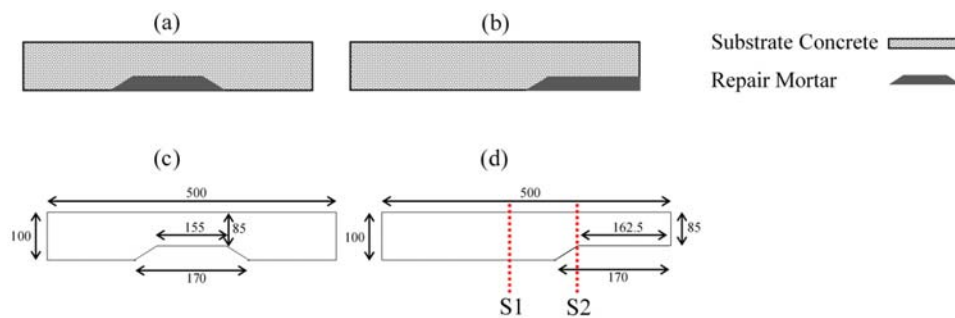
The repaired concrete beam (all dimensions are in mm): (a) center-repaired, (b) corner-repaired, (c) dimension of the center-repaired beams, and (d) dimension of the corner-repaired beams
